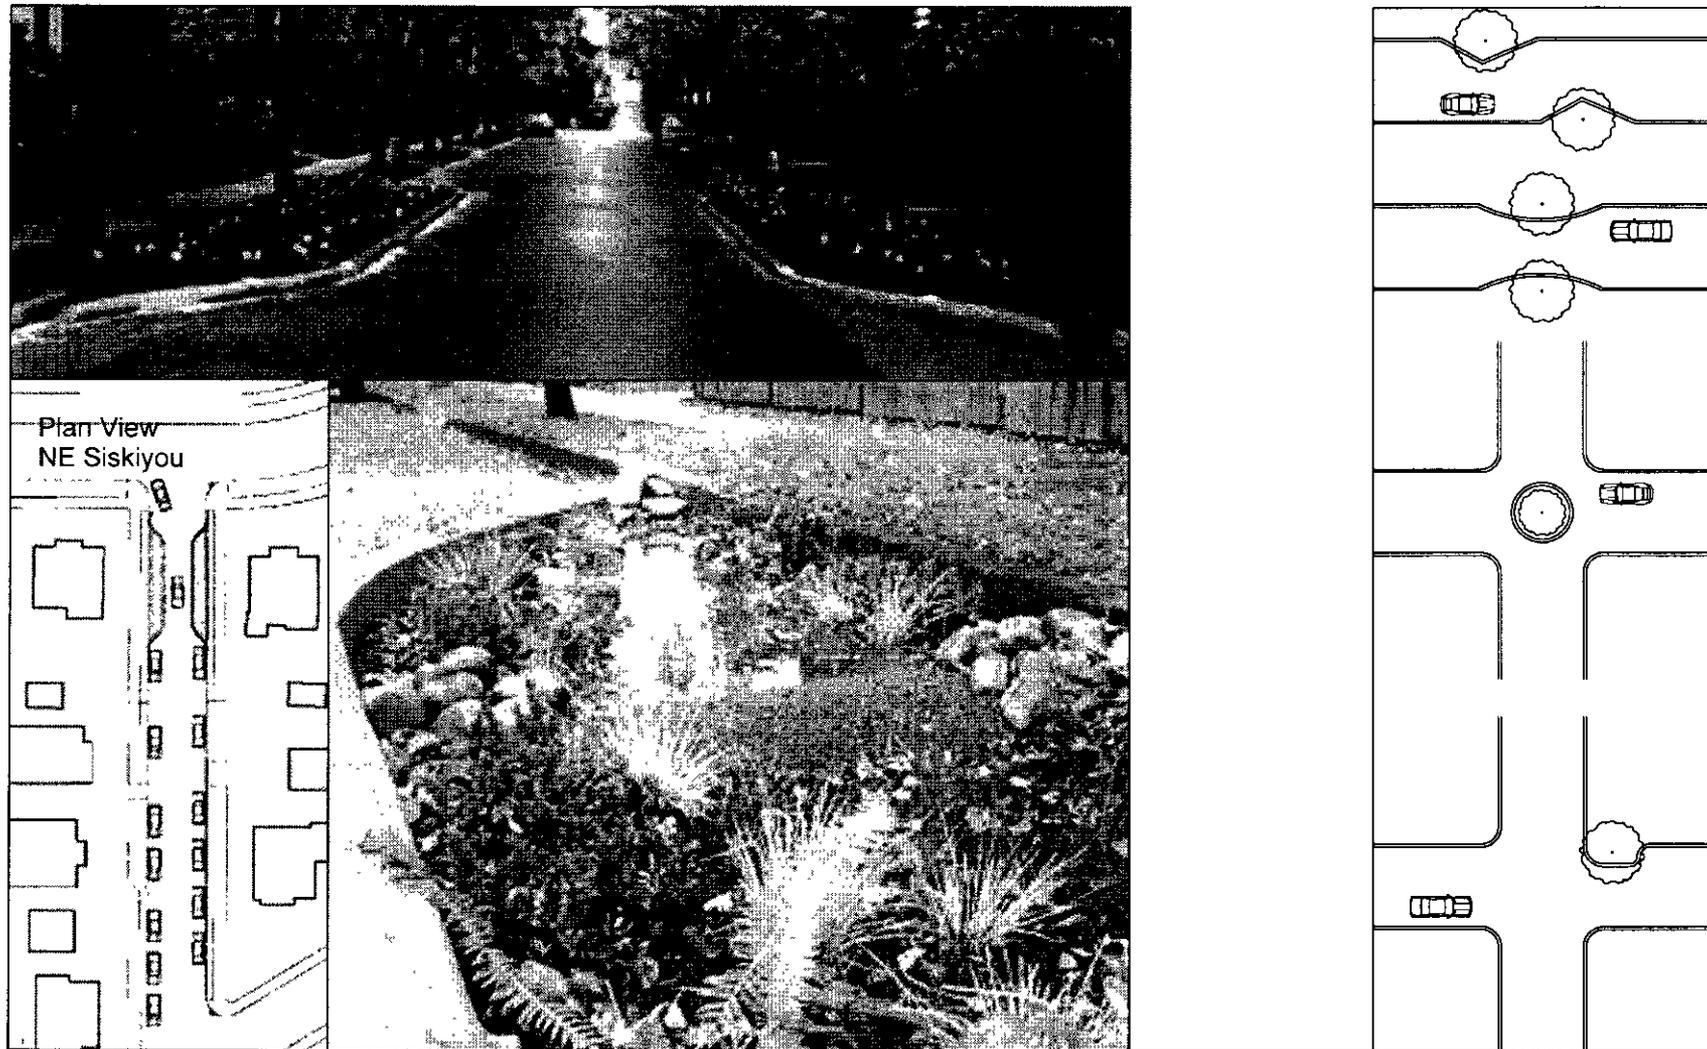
Street Design alternatives incorporating traffic calming and bioretention techniques
